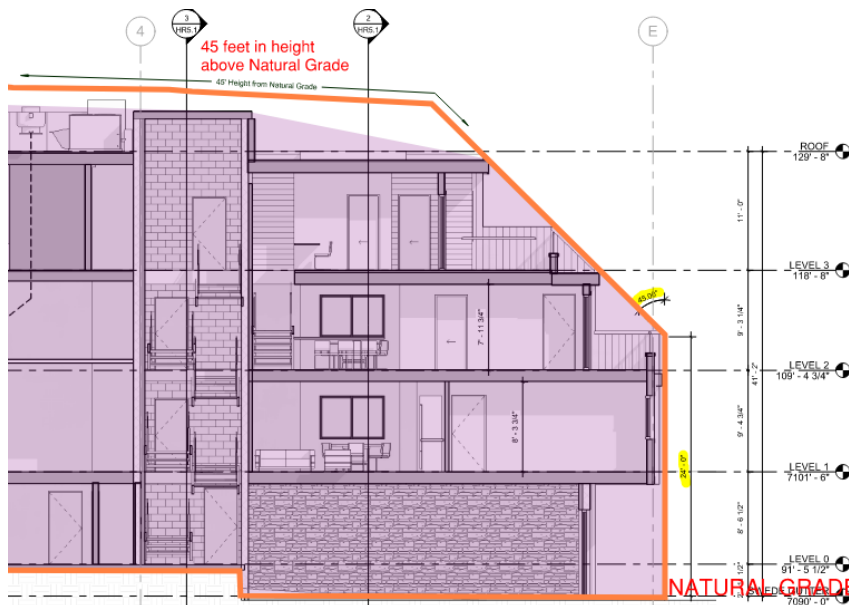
Excerpt from Applicant's plans with staff's markup showing the maximum Building volume outlined in orange and the proposed rear addition building volume.
